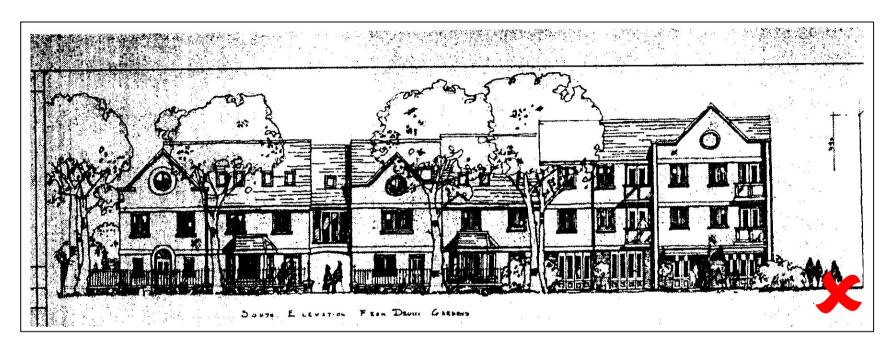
Proposed elevation onto Druitt Gardens – refused June 2004.
